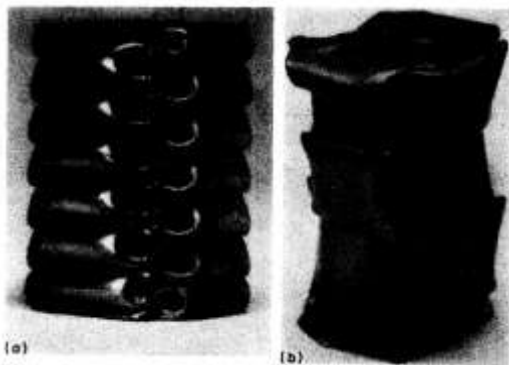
Axially crushed square tubes (a) Compact crushing mode (Aluminium tube $c/t = 32.4$) and (b) noncompact crushing mode (mild steel tube $c/t=100$), Ref [1].
